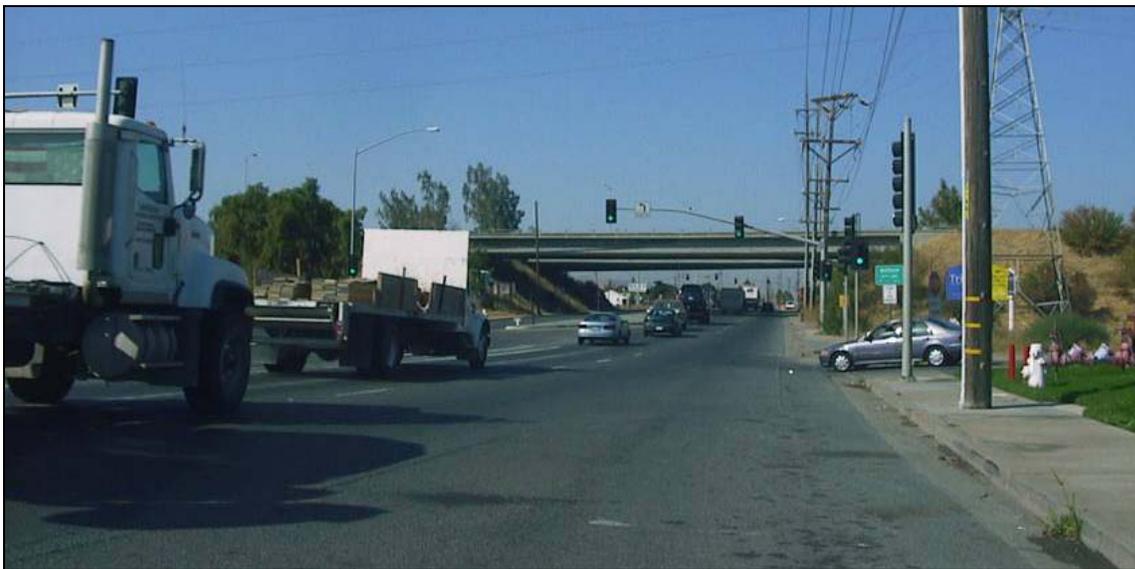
Site View Looking East from Bridgehead Road
